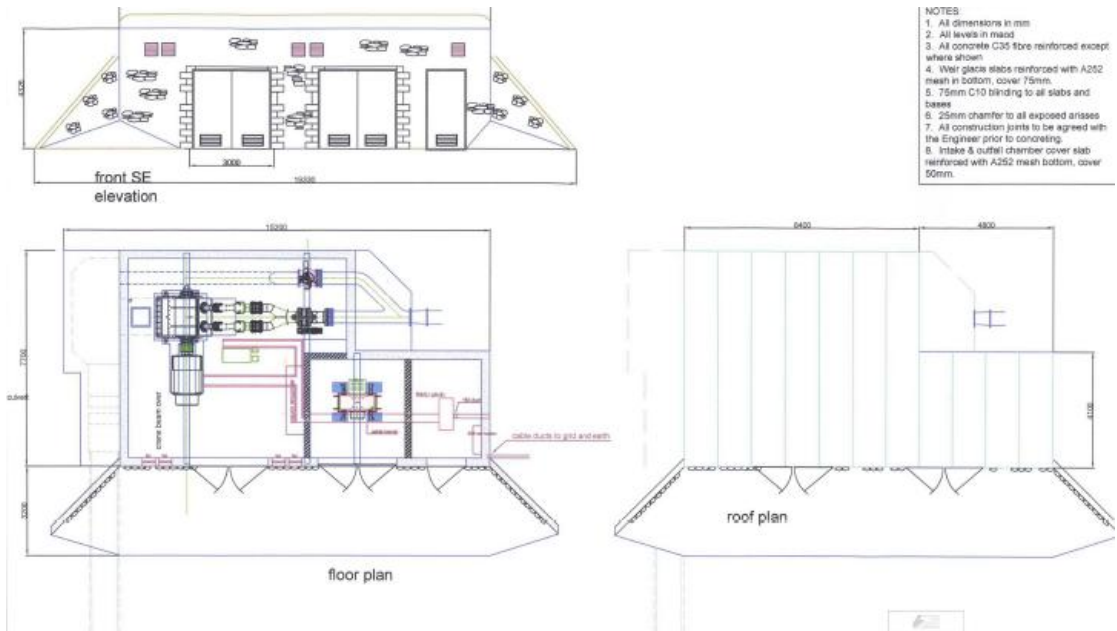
Floor plan - For illustrative purposes only (extract from drawing no. 854/I 12 D)
